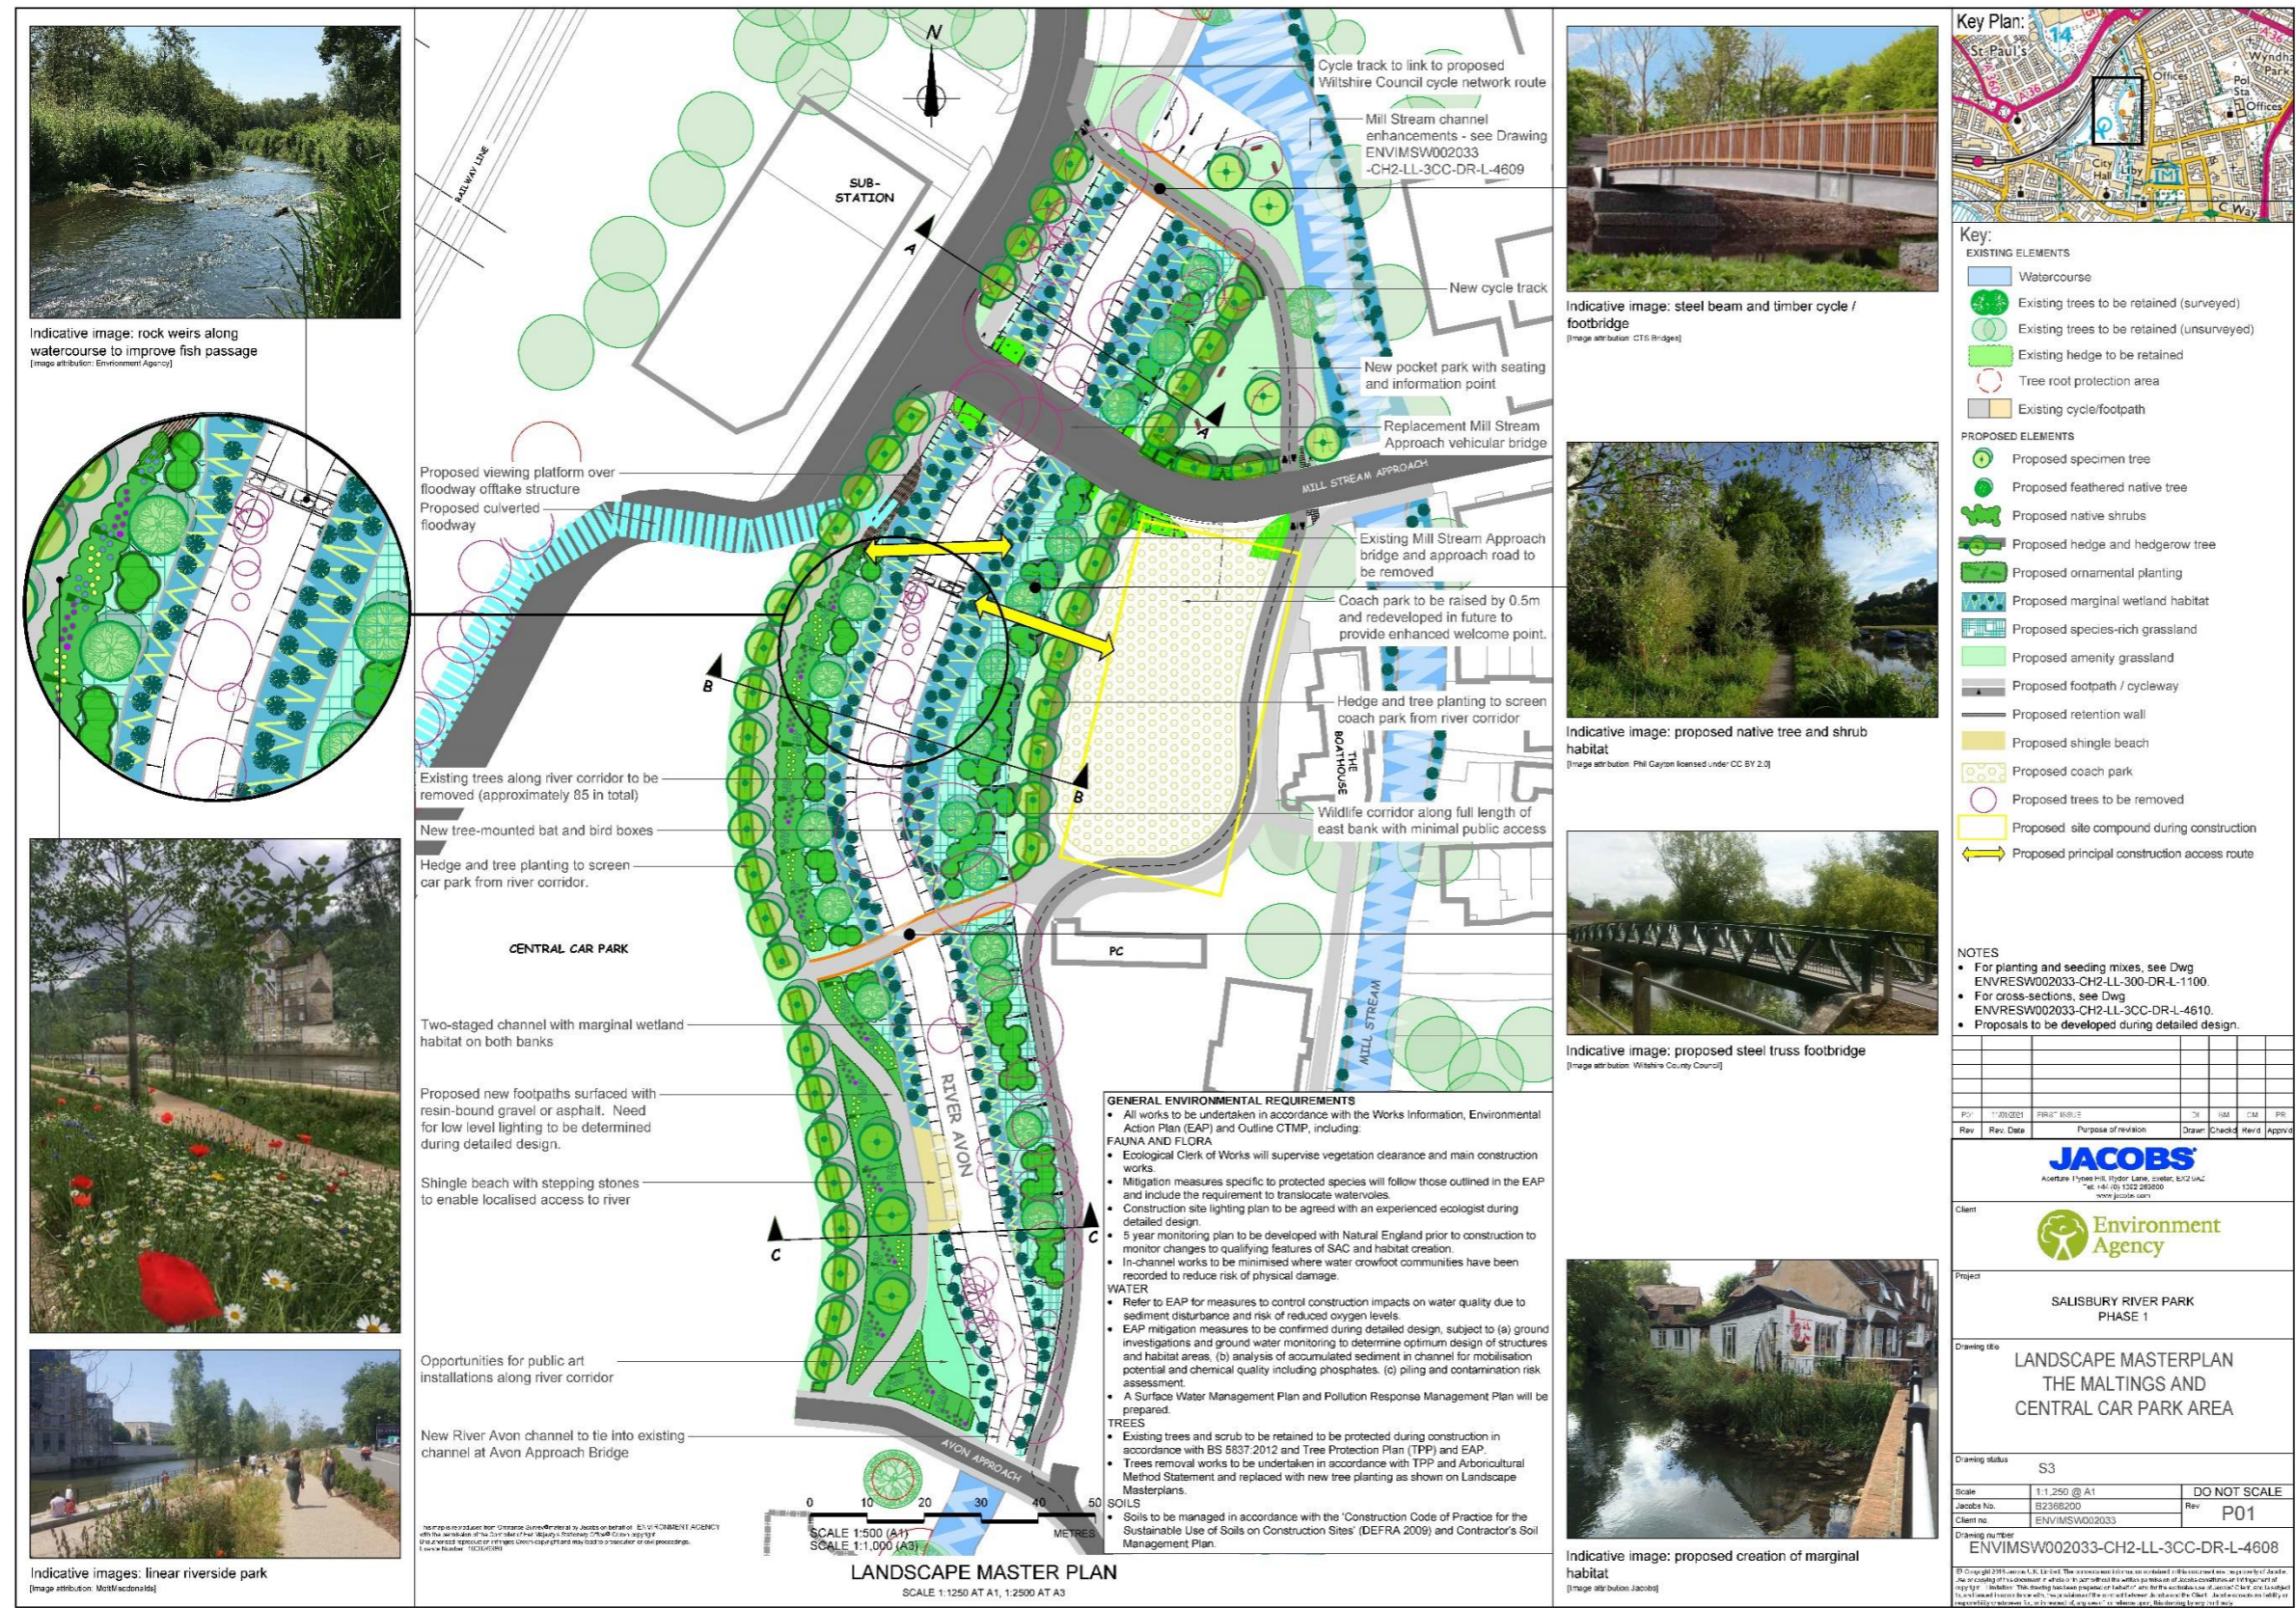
Maltings and Central Car Park Area Landscape Masterplan
